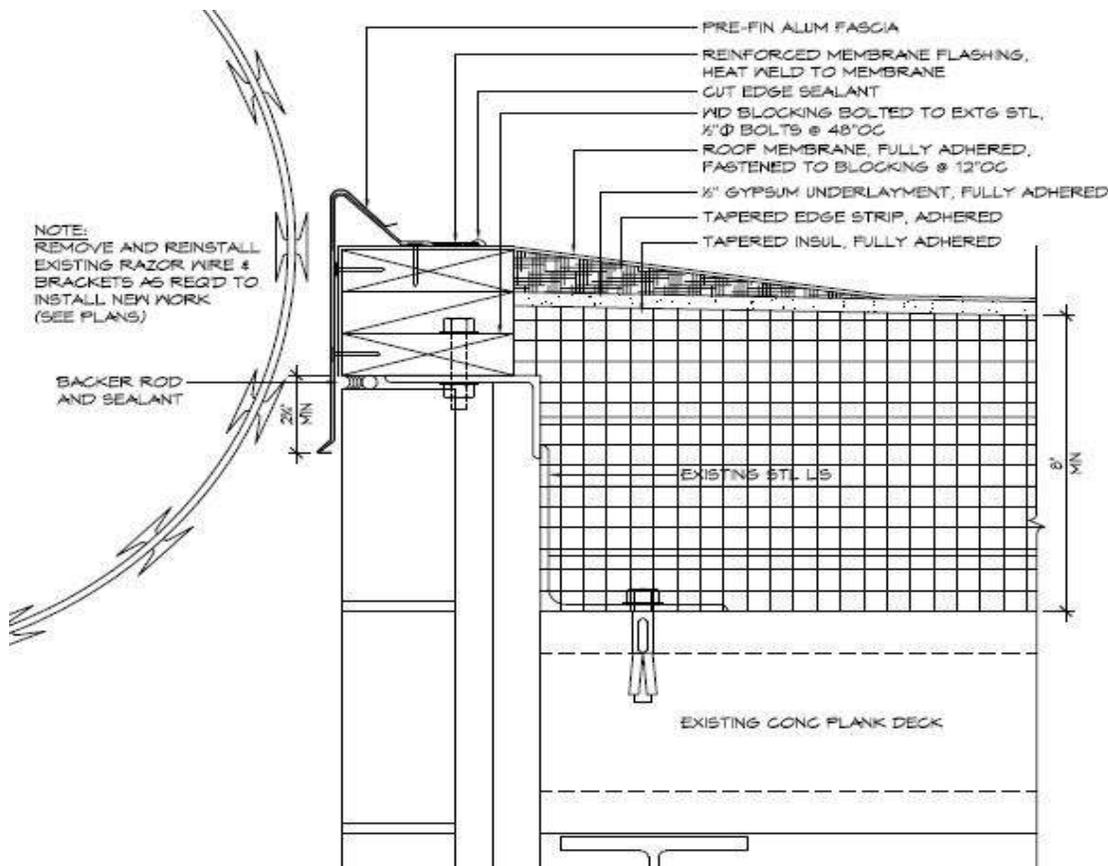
Roof Edge Detail for Unit 4 with 8 inches of Insulation
